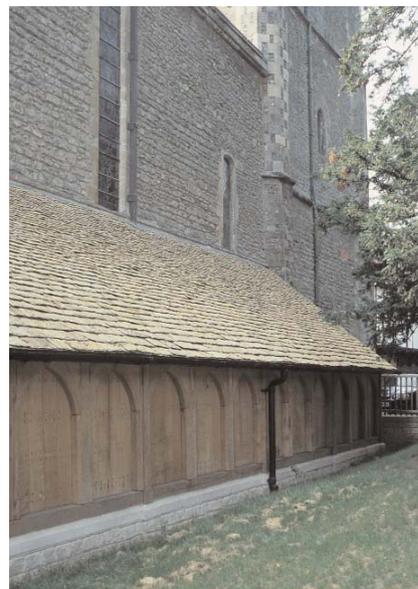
Protecting key elements. The Cloister Pentice, Dorchester Abbey. A new-build in green oak, exposed externally and well designed with regards to protection. There is an eaves overhang; the timber is elevated on a masonry sill well above the splash zone, and there is an effective rainwater drainage system
